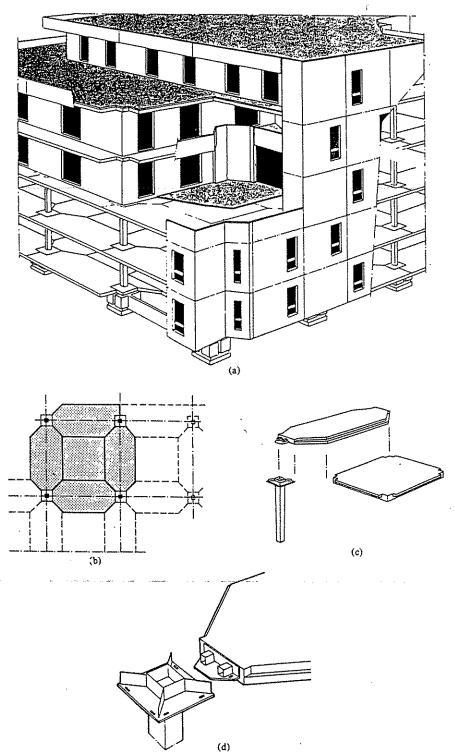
Etoile school system (France): (a) general scheme; (b),(c) structural elements; (d) connection detail.
